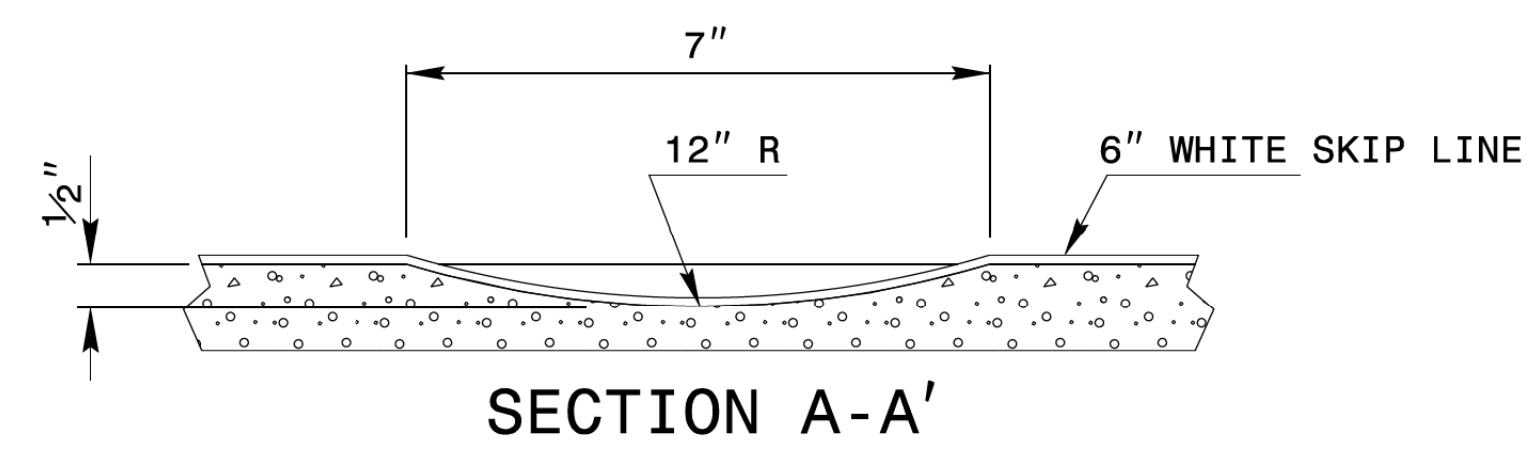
DETAIL OF INLAID RAISED PAVEMENT MARKER
